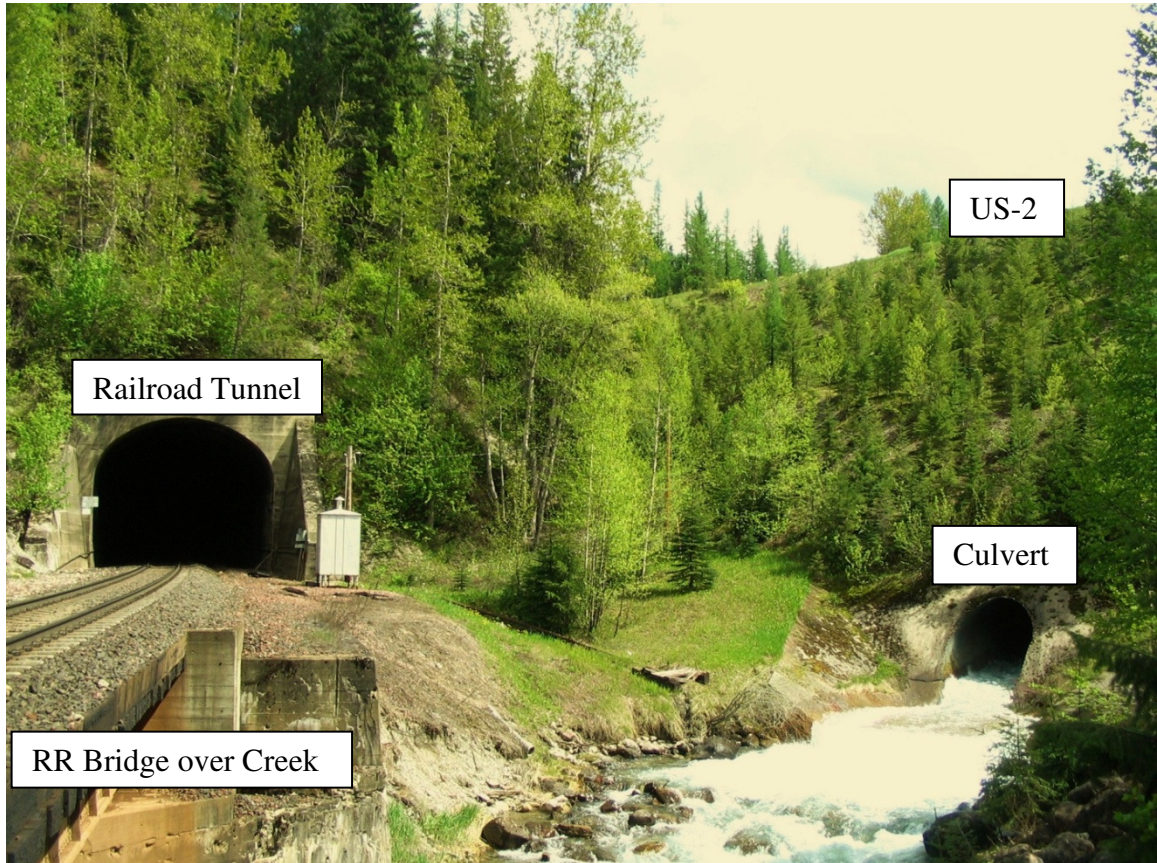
Railroad tunnel and large culvert located below US-2 at Tunnel Creek (MP173).
